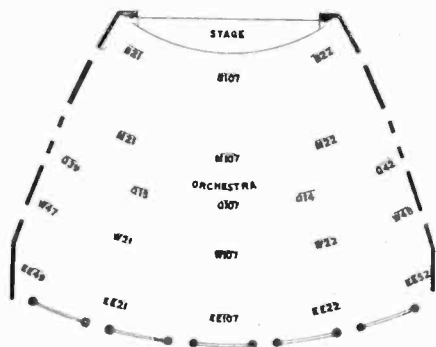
SEATING PLAN OF ORCHESTRA SECTION
